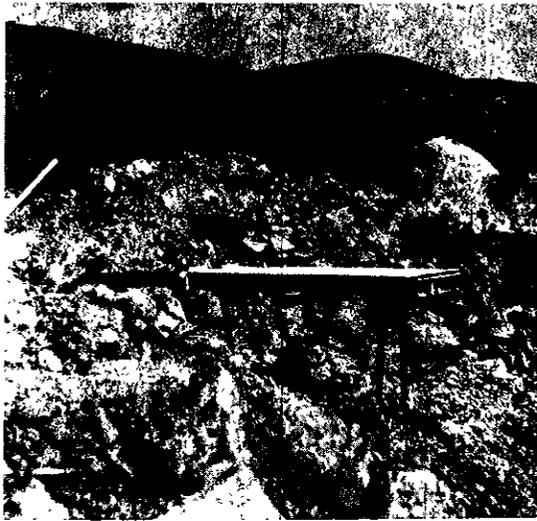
Horizontal movement indicator box supported on iron "chairs" in preparation for placing the concrete foundation.
